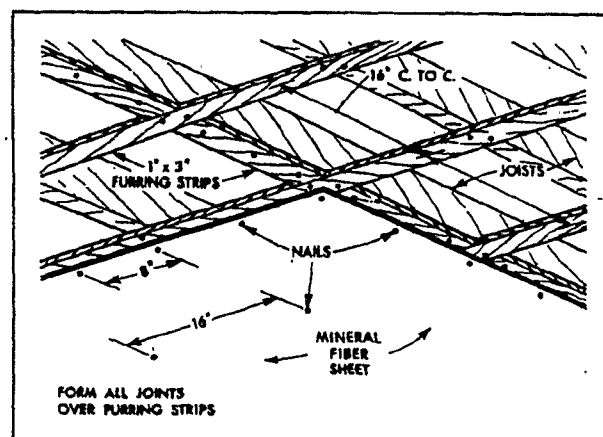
CEILINGS - Install 1 in. x 3 in. furring strips on 16 in. centers over joists, at right angles. Secure with two nails at each member. Form joints over furring strips.
